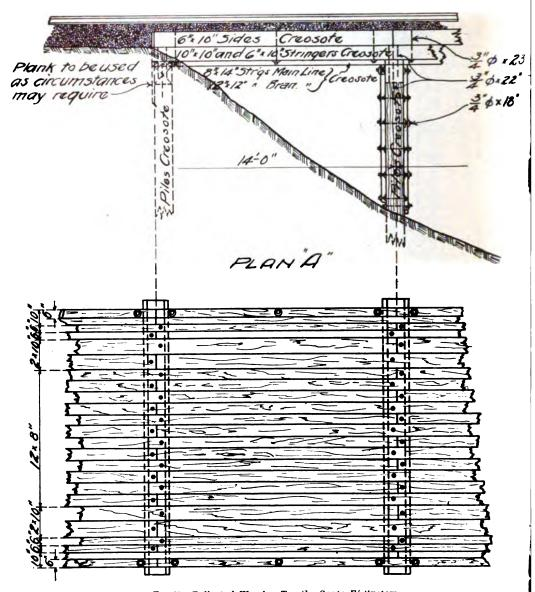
Ballasted Wooden Trestle, Santa Fé System.
